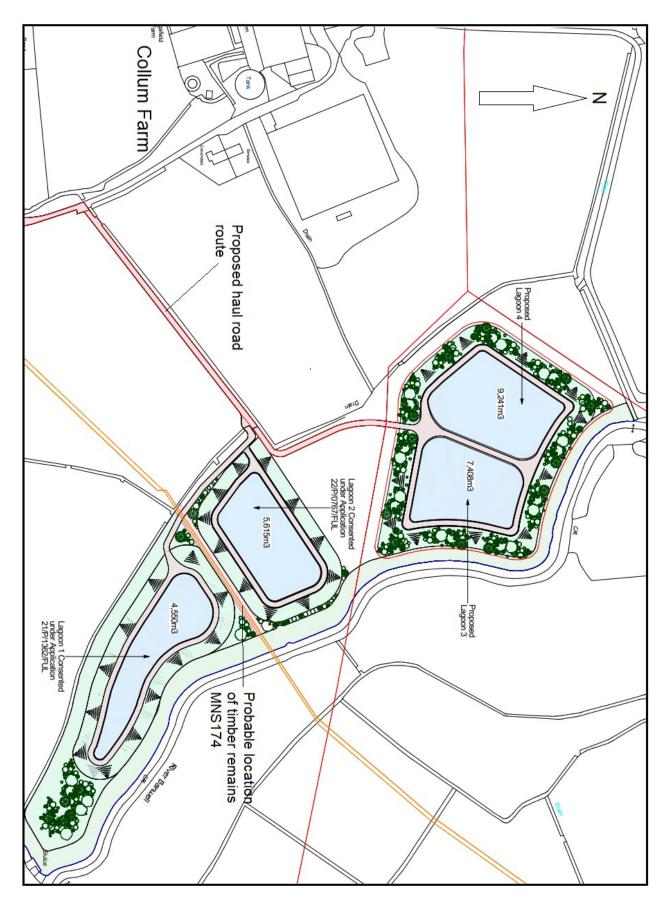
Collum Farm, Kewstoke. Plan of the Site as Proposed
